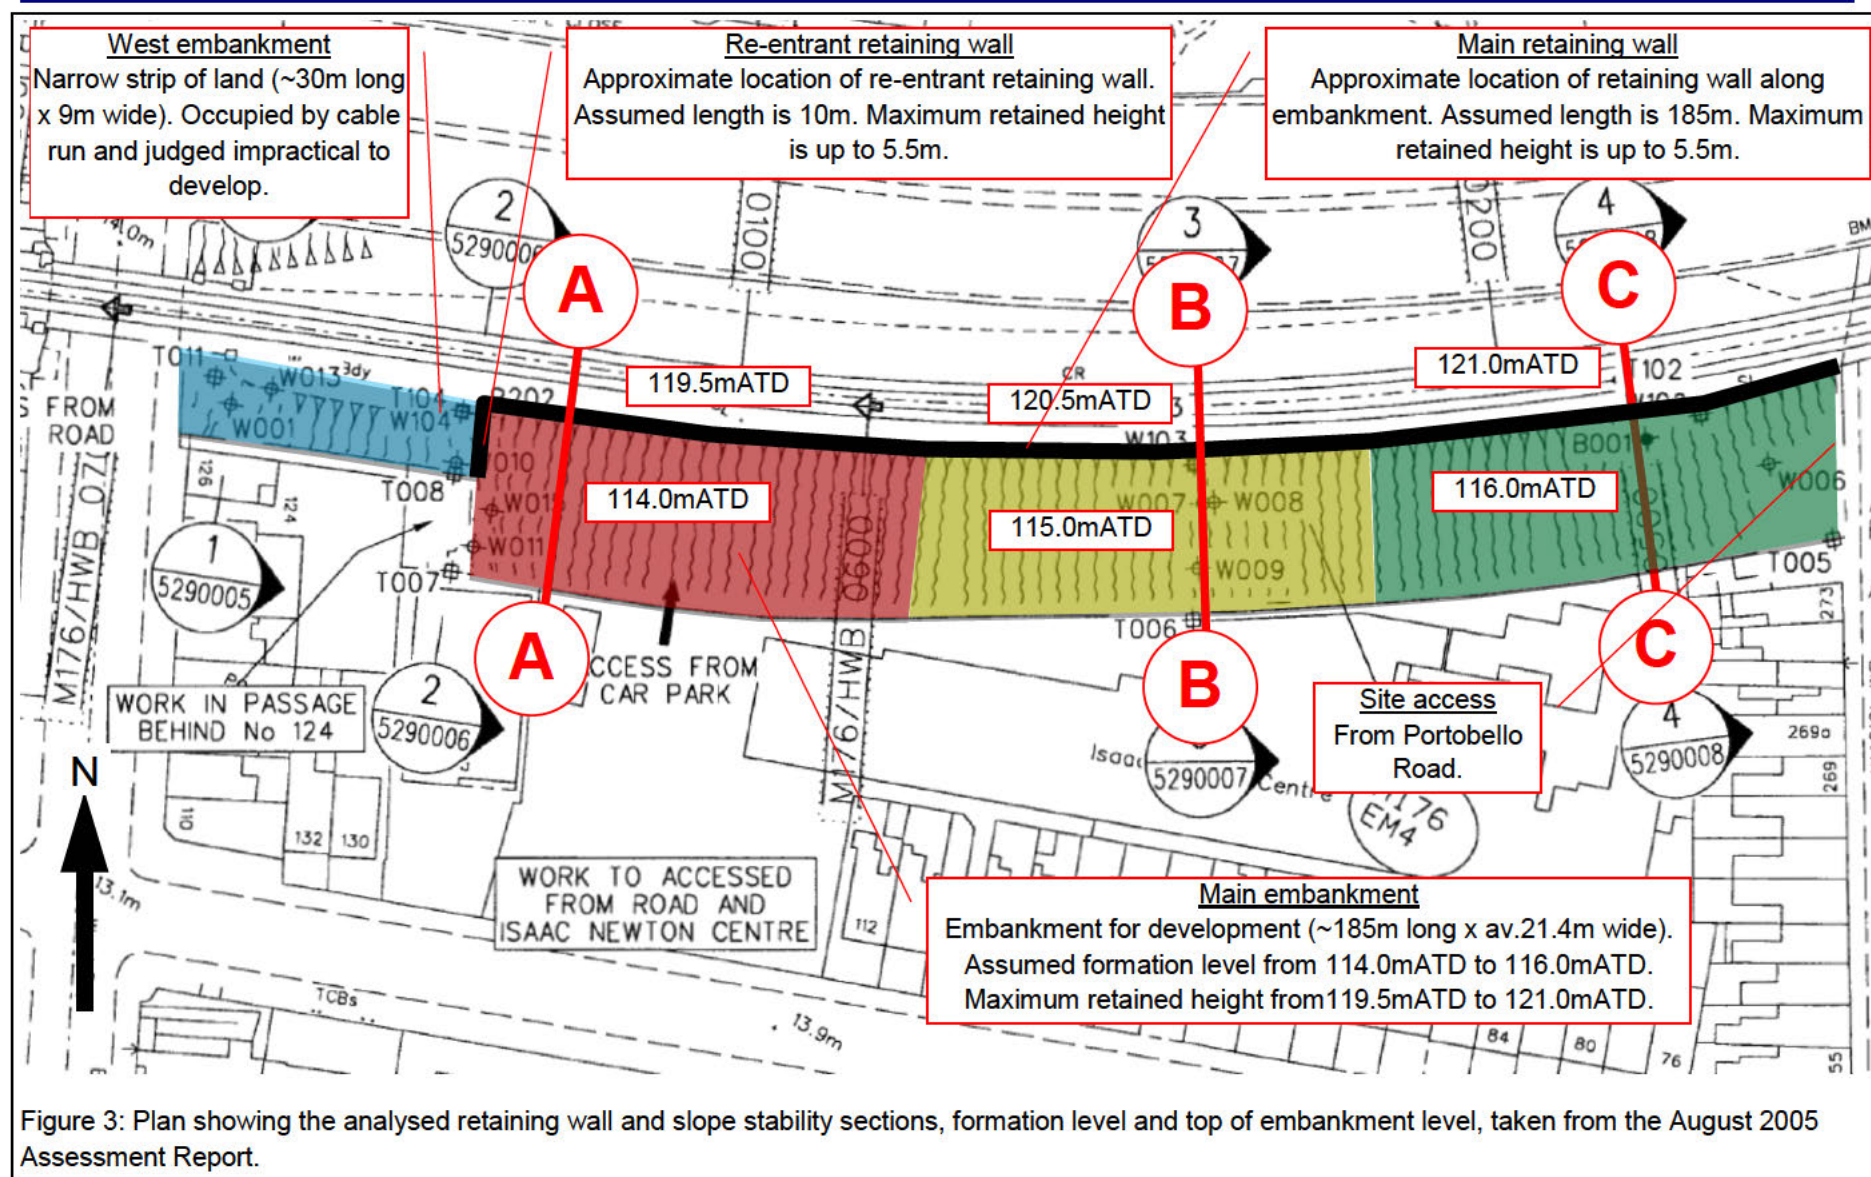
Plan showing the analysed retaining wall and slope stability sections, formation level and top of embankment level, taken from the August 2005 Assessment Report.
